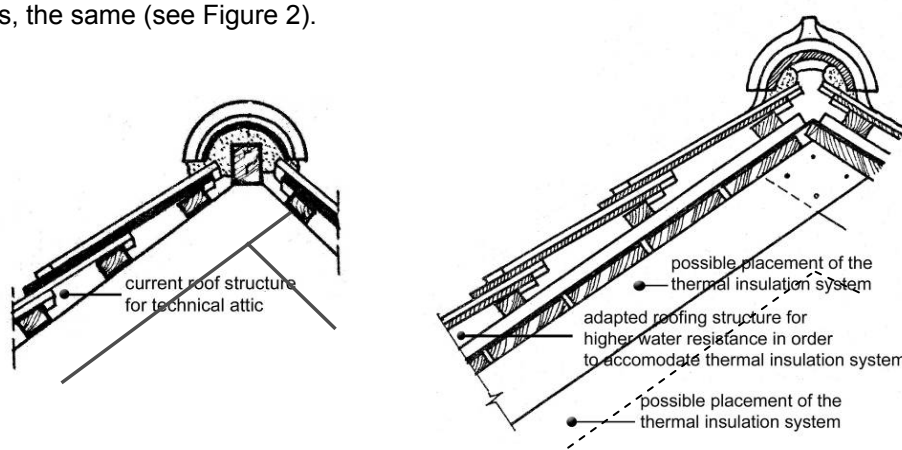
Roof structure with ceramic tiles for a traditional building with technical attic and the changes of the structure, for ensuring better water protection and thermal insulation, when converting the attic from technical to functional [3]
